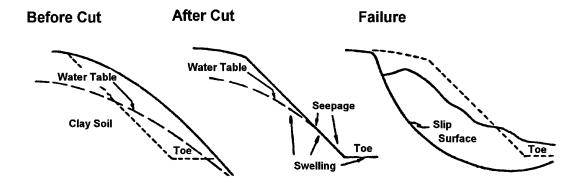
Typical Cut Slope Failure Mechanism in Clay Soils
